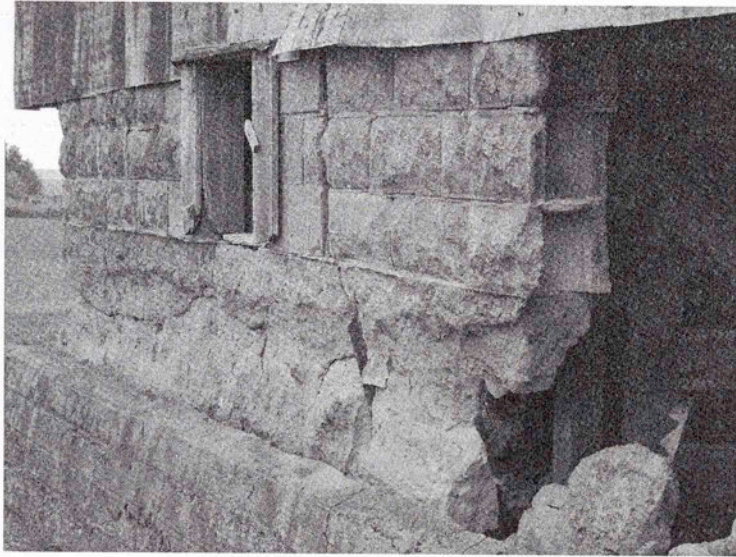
The northeast corner of Otto Bredel's barn has collapsed, showing a tripartite expression of three different masonry materials in a banded composition: poured-in-place concrete foundation, a foundation wall of brick and stone infill, and rock-faced concrete block. (Photo by Lynda Ramsey)
